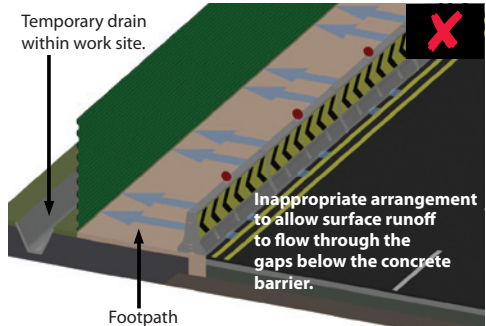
Where a footpath is located behind the precast concrete safety barrier, the surface runoff should not be allowed to flow through the gaps below the precast concrete barrier and across the footpath as this will result in inconvenience for pedestrians and slippery condition along the footpath. A proper drainage inlet could be provided in front of the precast concrete safety barrier to channel the surface runoff below the footpath and into the roadside drain.
